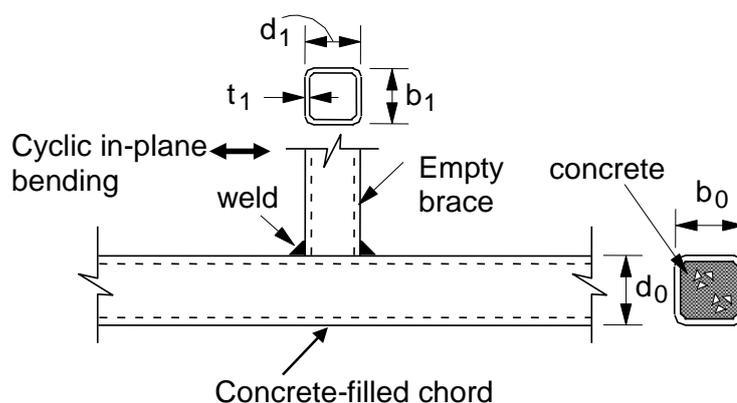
SHS-SHS T-joint with concrete filled chord under cyclic in-plane bending load
